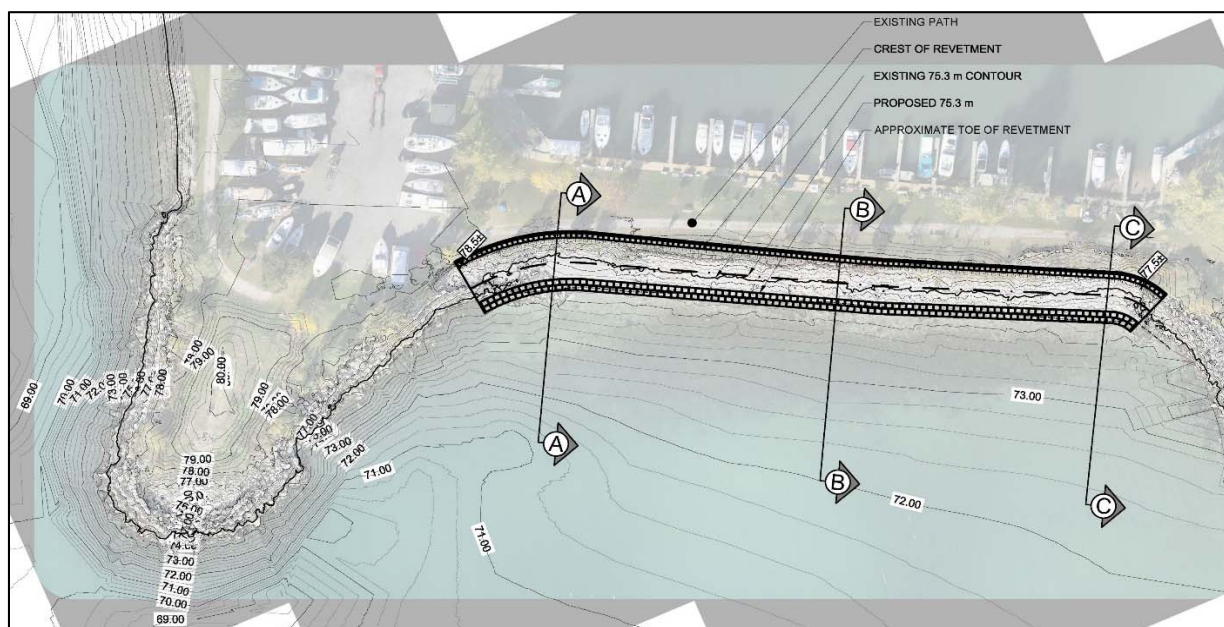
Concept design plan view for Option 2B - Armourstone Revetment. Source: Shoreplan Engineering, 2017.
